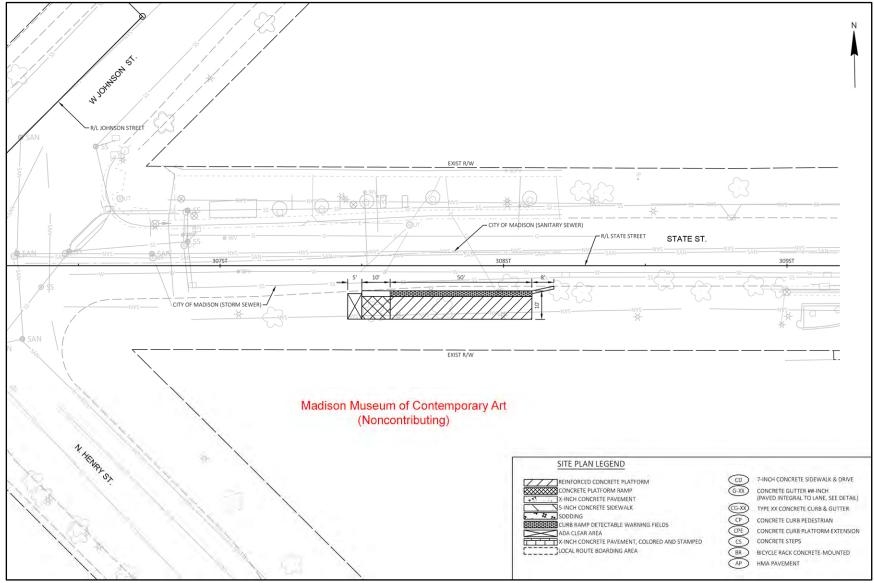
State Street at Johnson Street – Plan View of Proposed Curbside Station
